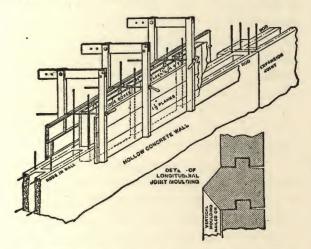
Method of form construction for a hollow wall. Notice the reinforcing rods and how they are placed.
